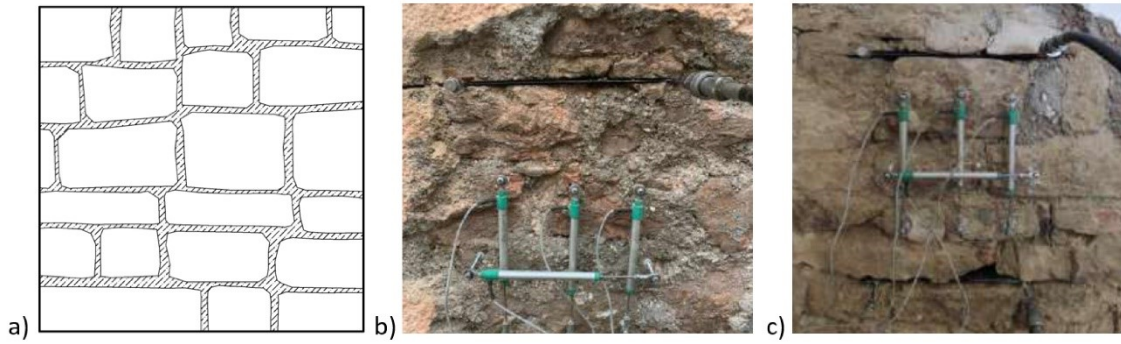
Irregular soft stone masonry (M4) – a) Graphic reconstruction of the wall texture type (1m x 1m); b) Double flat-jack test execution, photo taken in Fiastra (MC) [credits: LA.TE.MA srl]; c) Double flat-jack test execution, photo taken in Monte San Martino (MC) [credits: LA.TE.MA srl].
